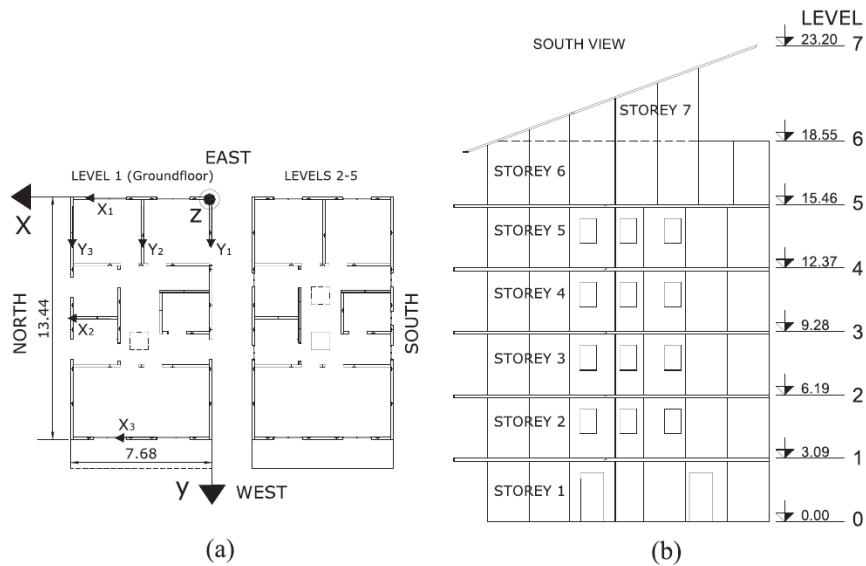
(a) Plan and (b) Elevation view of the 7-story test specimen tested in Ceccotti et al. [2013]
